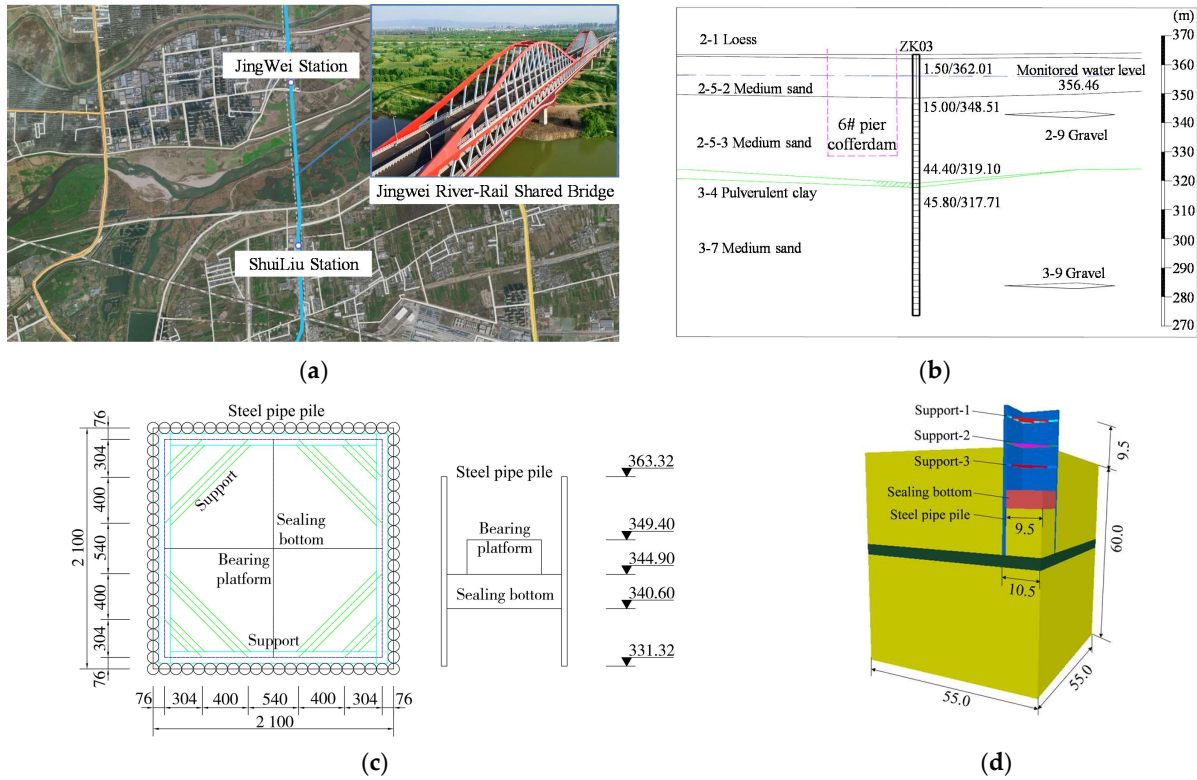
(a) Outdoor scene, (b) stratum distribution, (c) structural design, and (d) numerical model of 6# pier steel pipe pile cofferdam.
